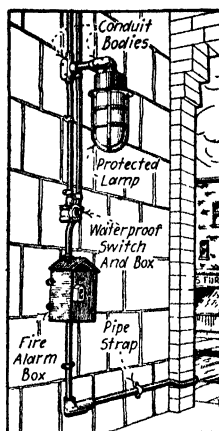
An installation of "surface" exposed conduit wiring on the outside of a building. (All fittings in exterior work must be waterproof.)
